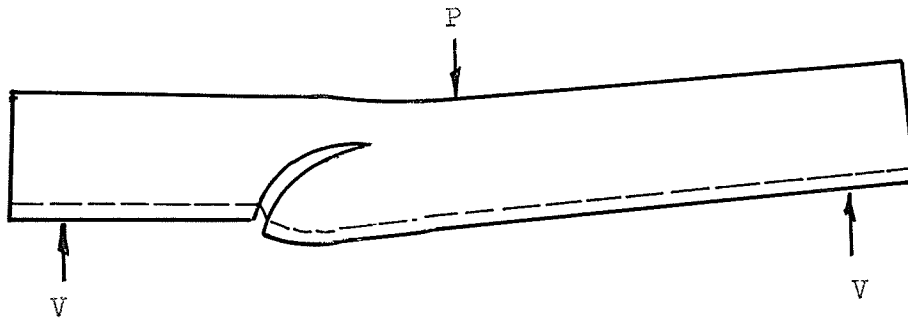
TYPICAL PATTERNS OF CRACKING
